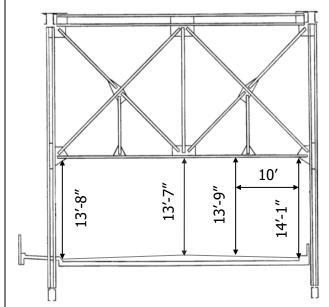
Cross-section view of through truss bridge showing vertical clearances.
